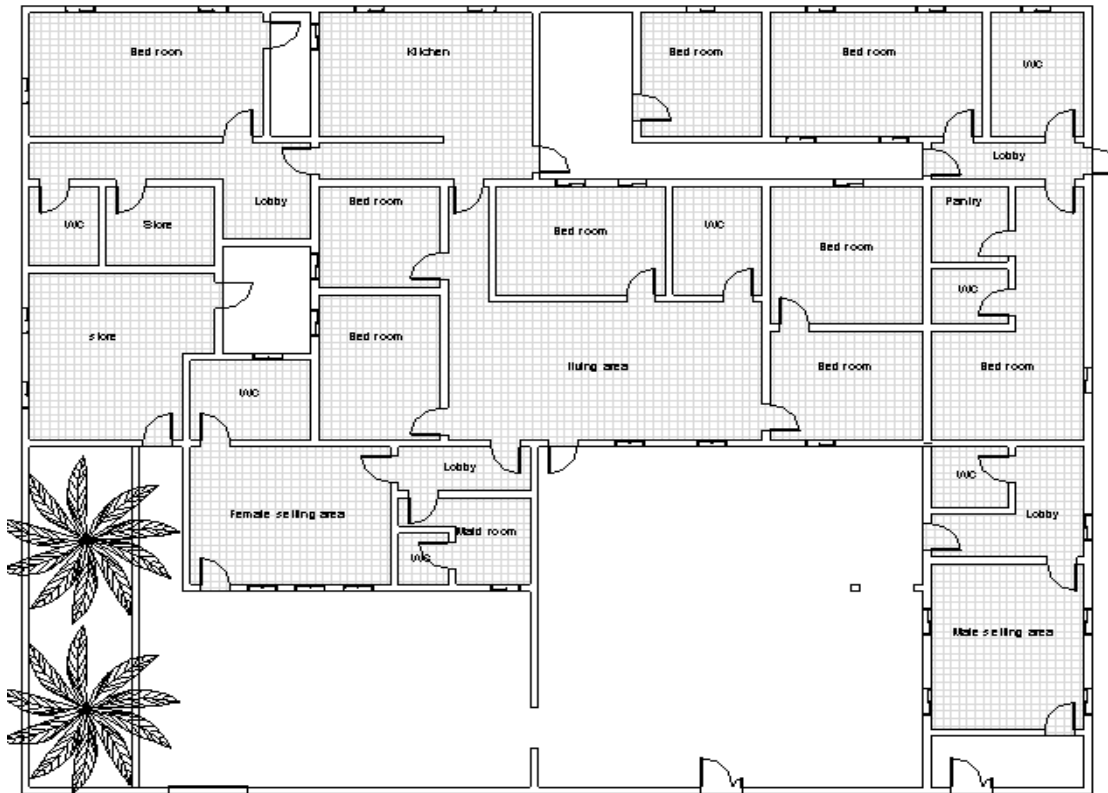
Plan of a traditional Emirati house Revit® 2017
